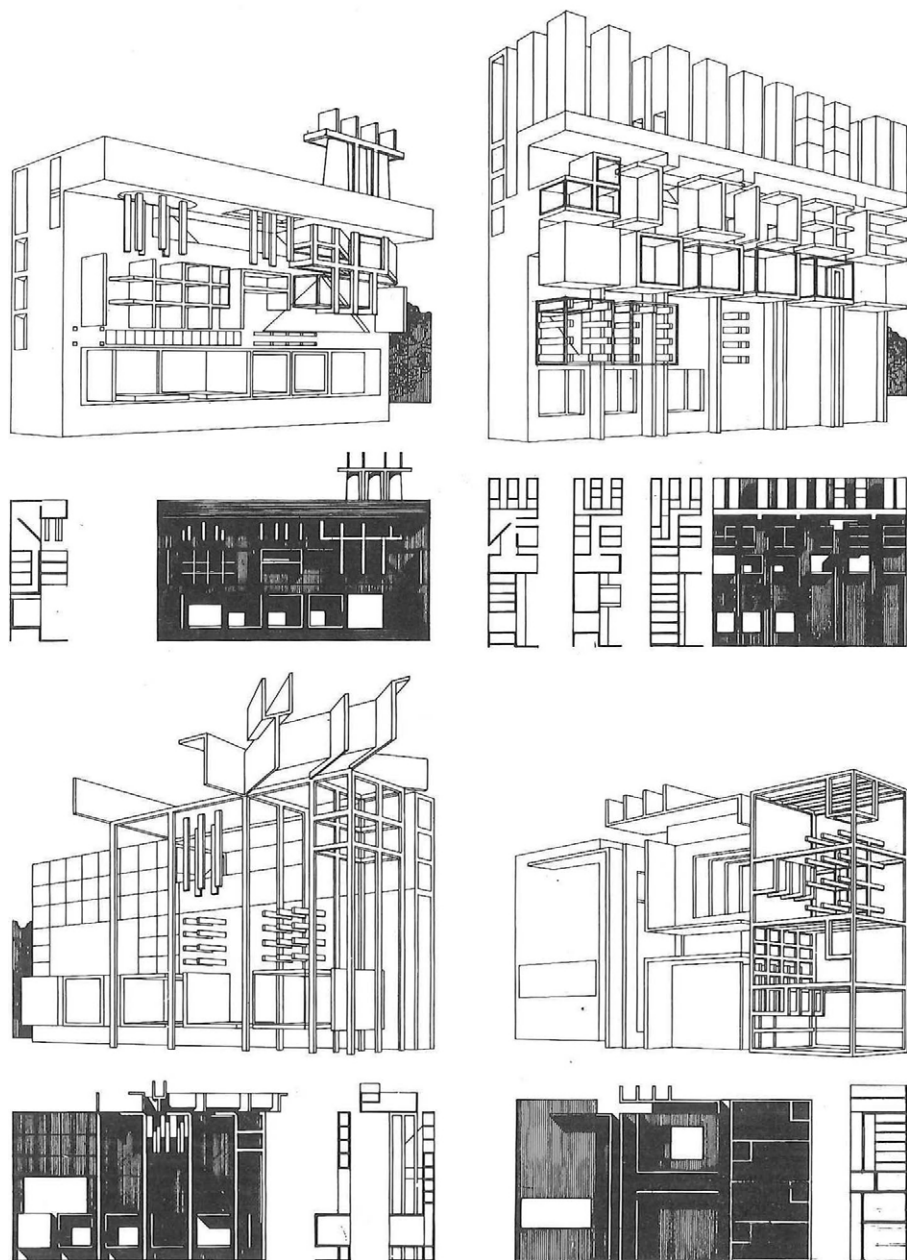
From top to bottom, left to right: Lamellar buildings: views, sections and elevations.
